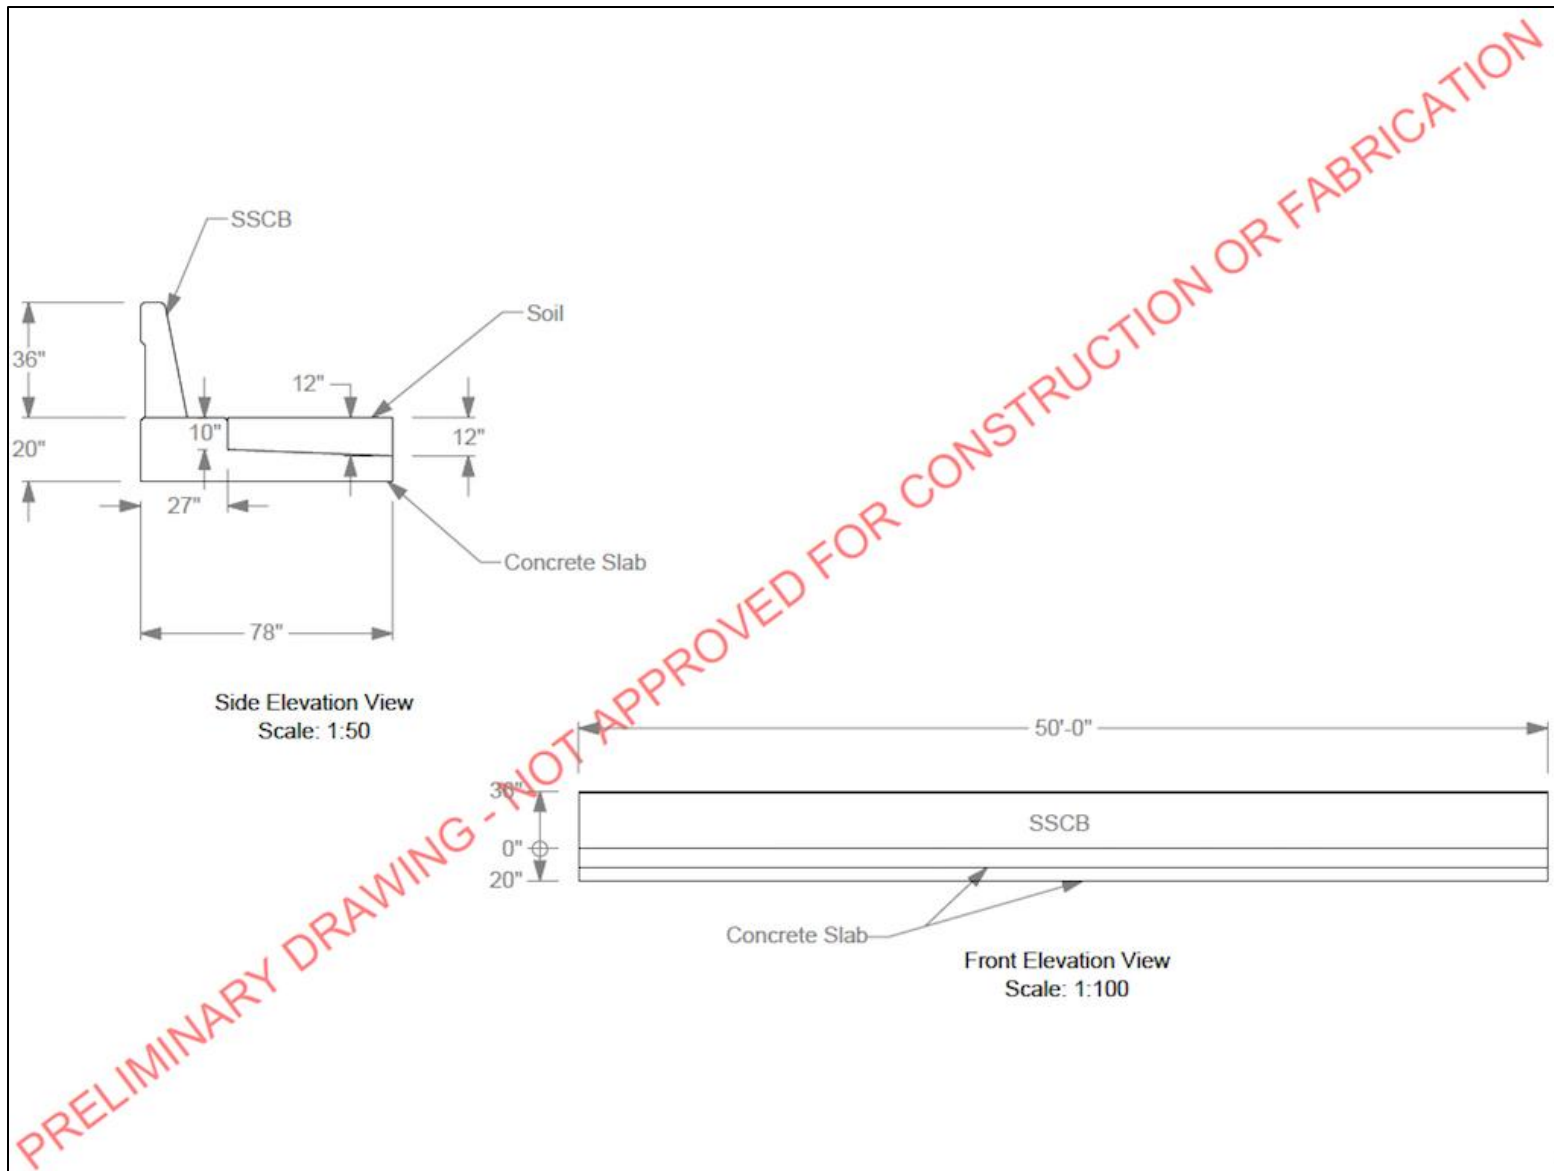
Design Concept 3 – Concrete Beam and Moment Slab Hybrid Foundation (TTI, 2017)
